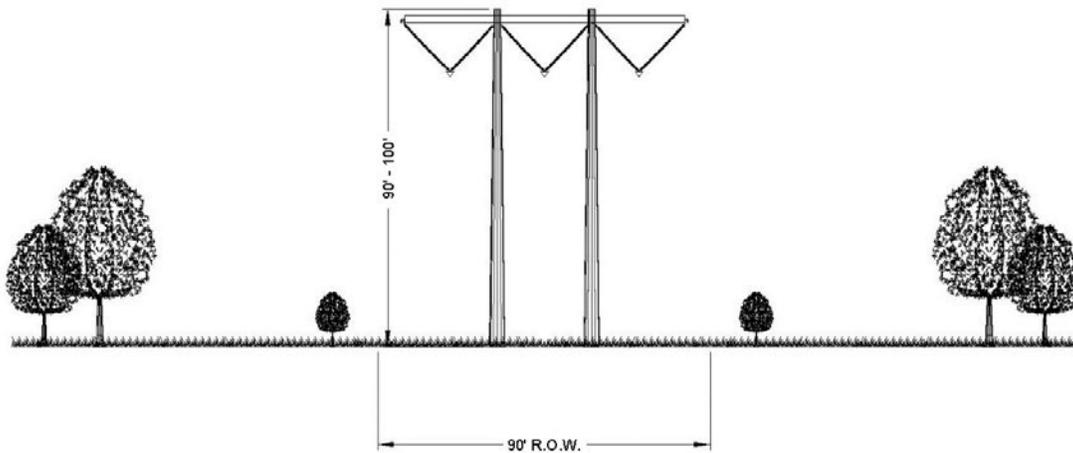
through B-24 illustrate the ROW width requirements for the proposed and alternative tangent structures. The determination of these widths is based on three criteria:
